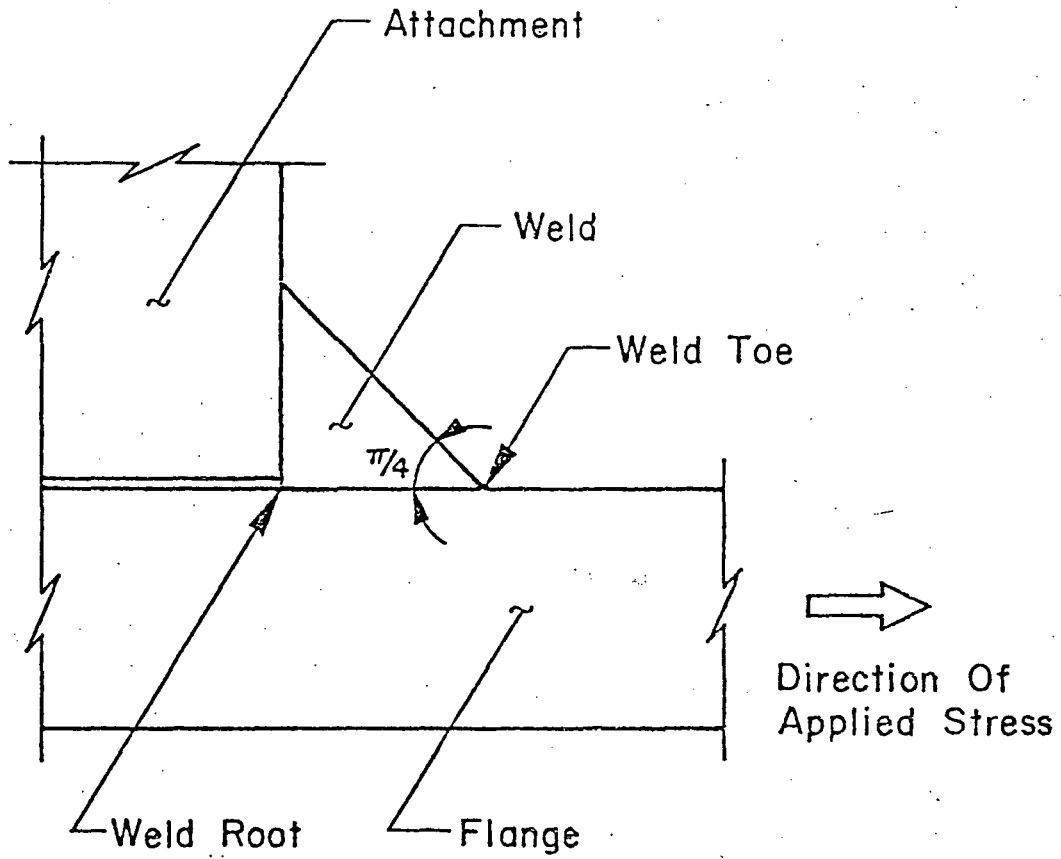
Flange Attachment with Transverse Fillet Weld
